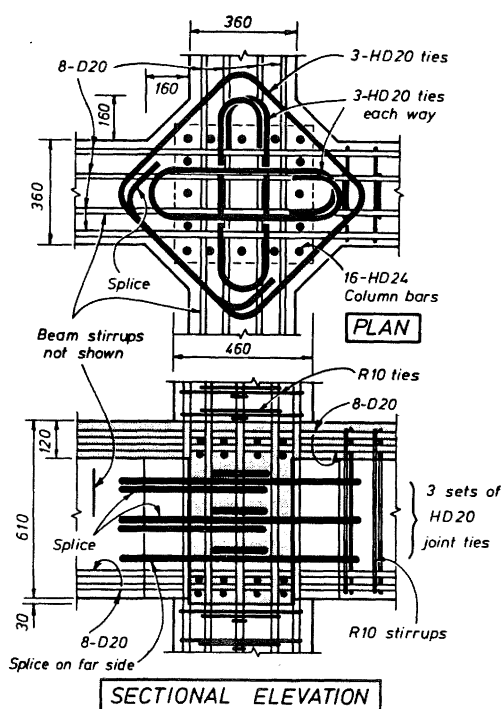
JOINT SHEAR REINFORCEMENT FORMED WITHIN HORIZONTAL BEAM HAUNCHES [35]
